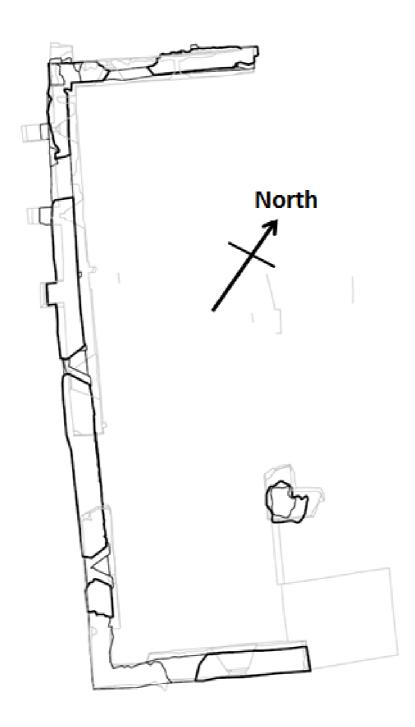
Plan of the ruins at first floor level (after English Heritage Drawn Survey Team)
